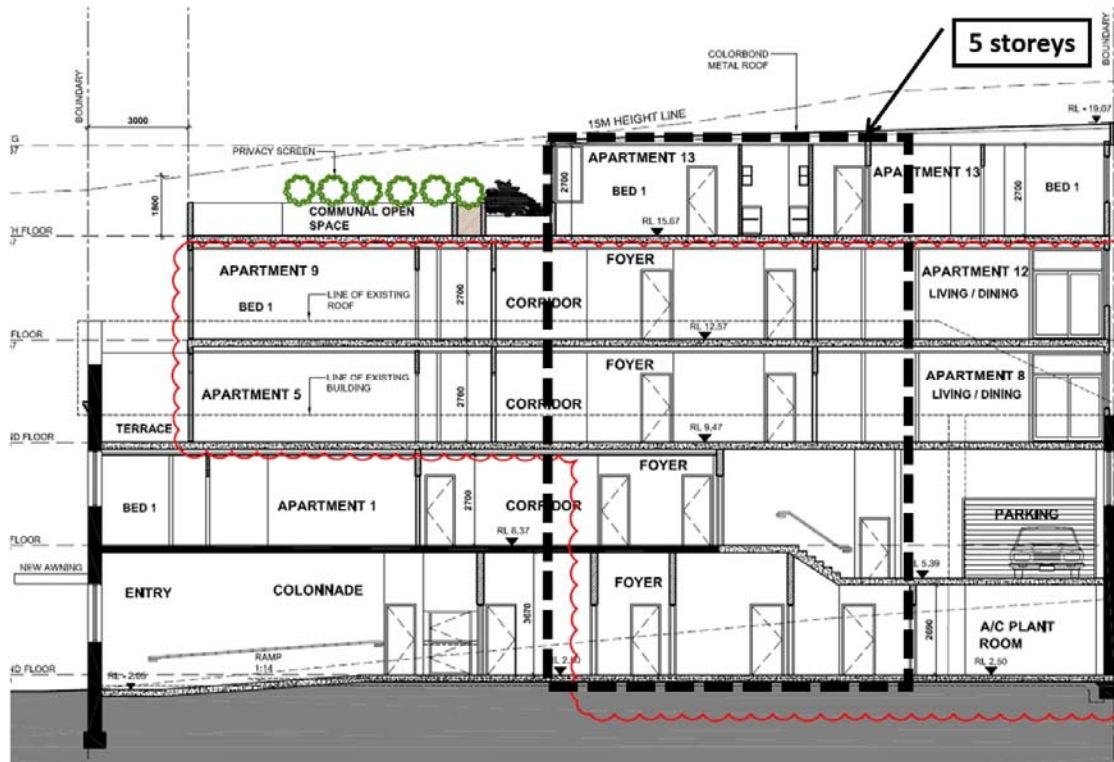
Section showing portion of building that comprises five storeys marked in thick dashed line.
